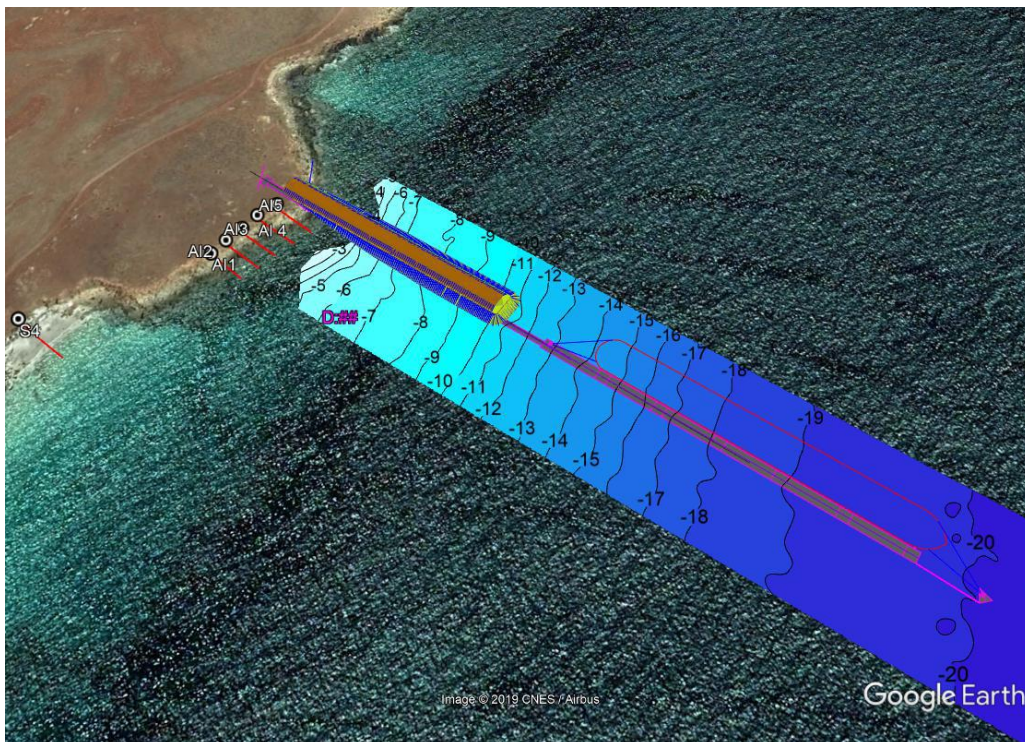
The inner section of the proposed Port Spencer is an approximately 220 m long causeway/reclamation out to 10-11 m depth.
